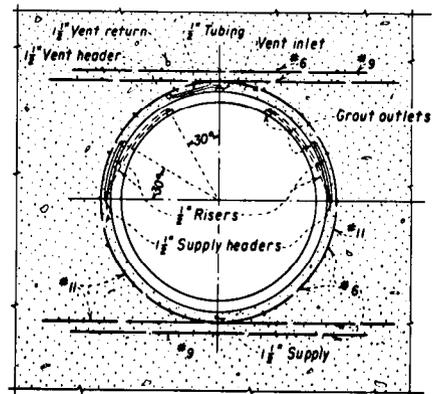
Diversion tunnel closure structure for a large concrete dam (Flaming Gorge Dam in Utah).—288-D-3003
